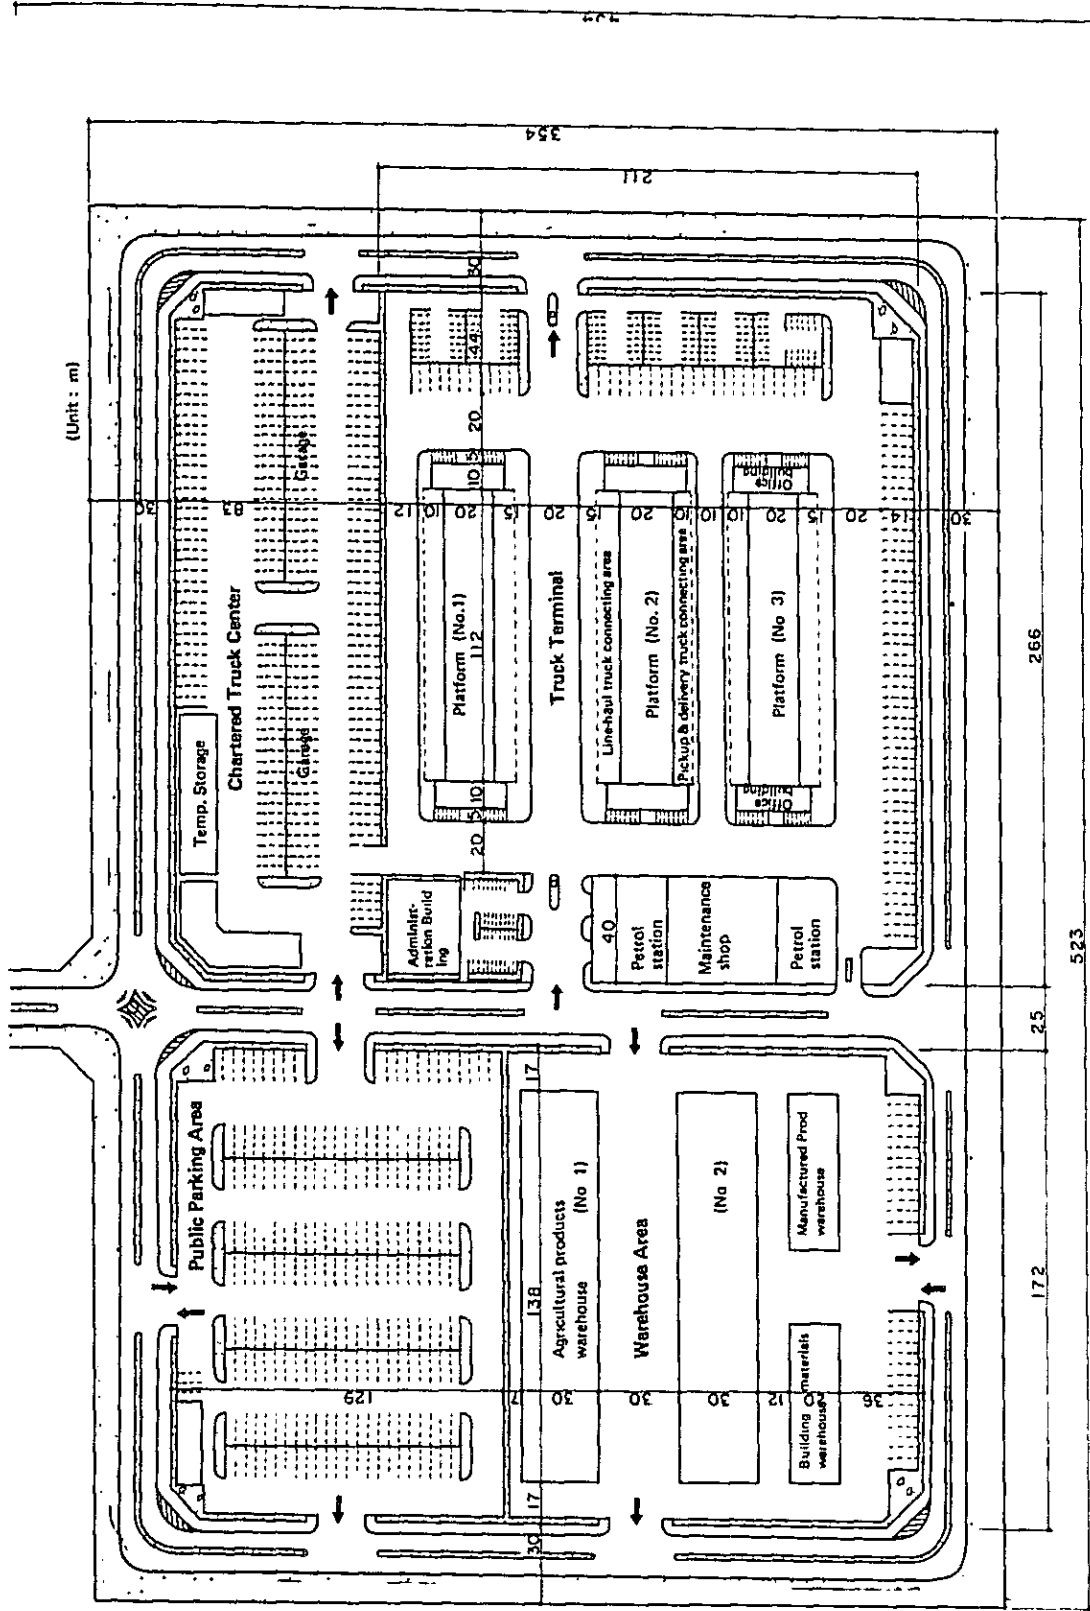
TERMINAL-W LAYOUT (ALTERNATIVE-33)
